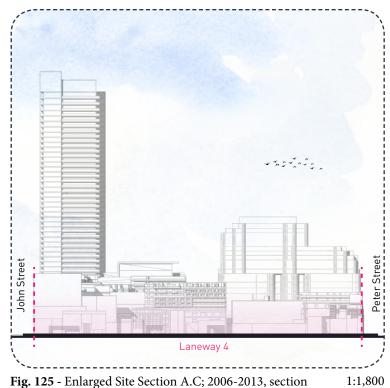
Enlarged Site Section A.C; 2006-2013, section
